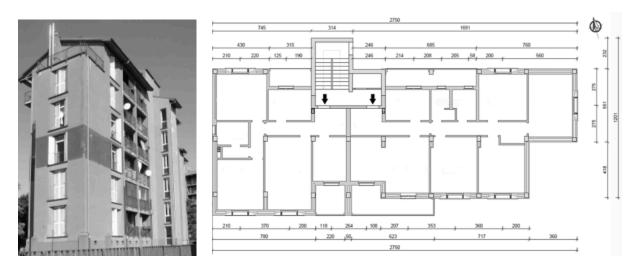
Reference RC building typical of the European post-WWII building stock: external view and plan
